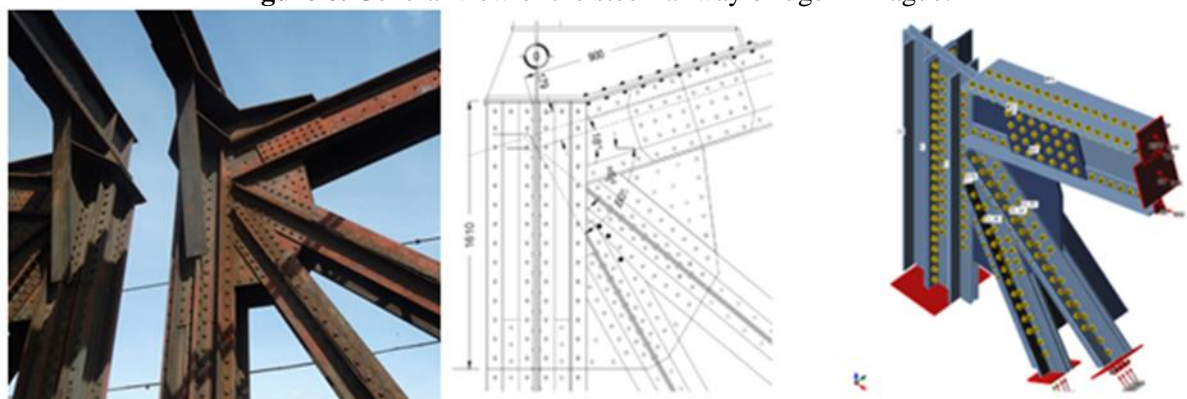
Connection C-02 on railway bridge in Prague, its drawing and its CBFEM model.
